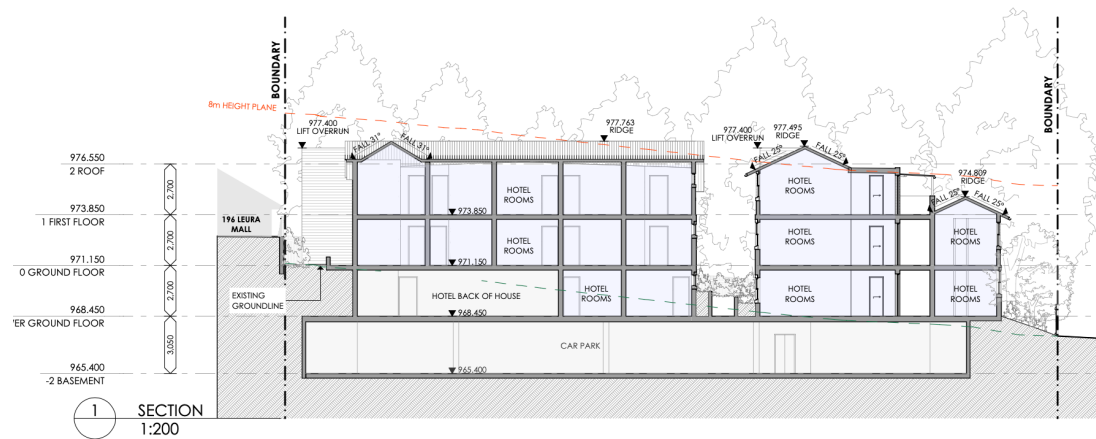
Section Drawing 9 (Source: PTI Architecture).
